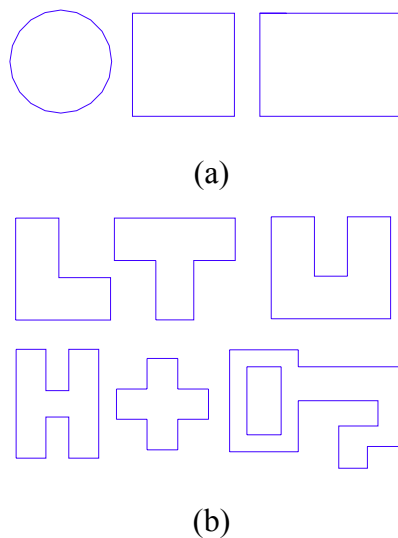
Different building forms: (a) Simple building form, (b) Complex building form
